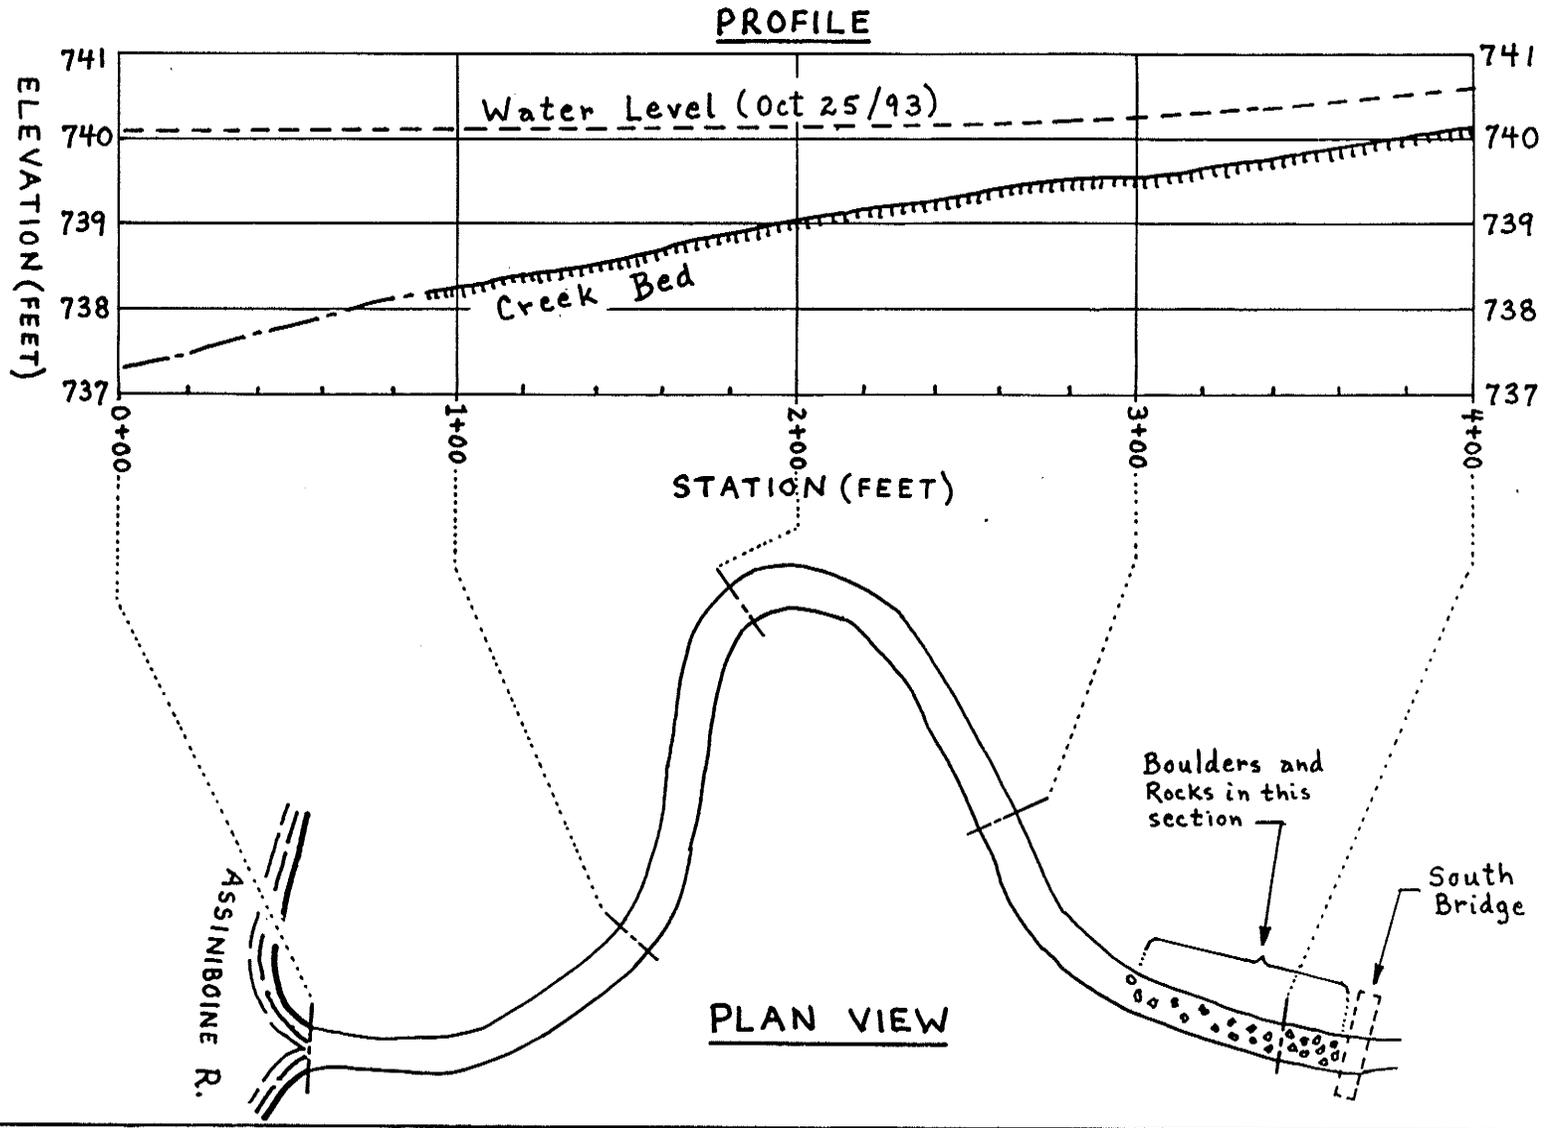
Detailed plan and profile views of the Natural Reach of Truro Creek in Bruce Park.
